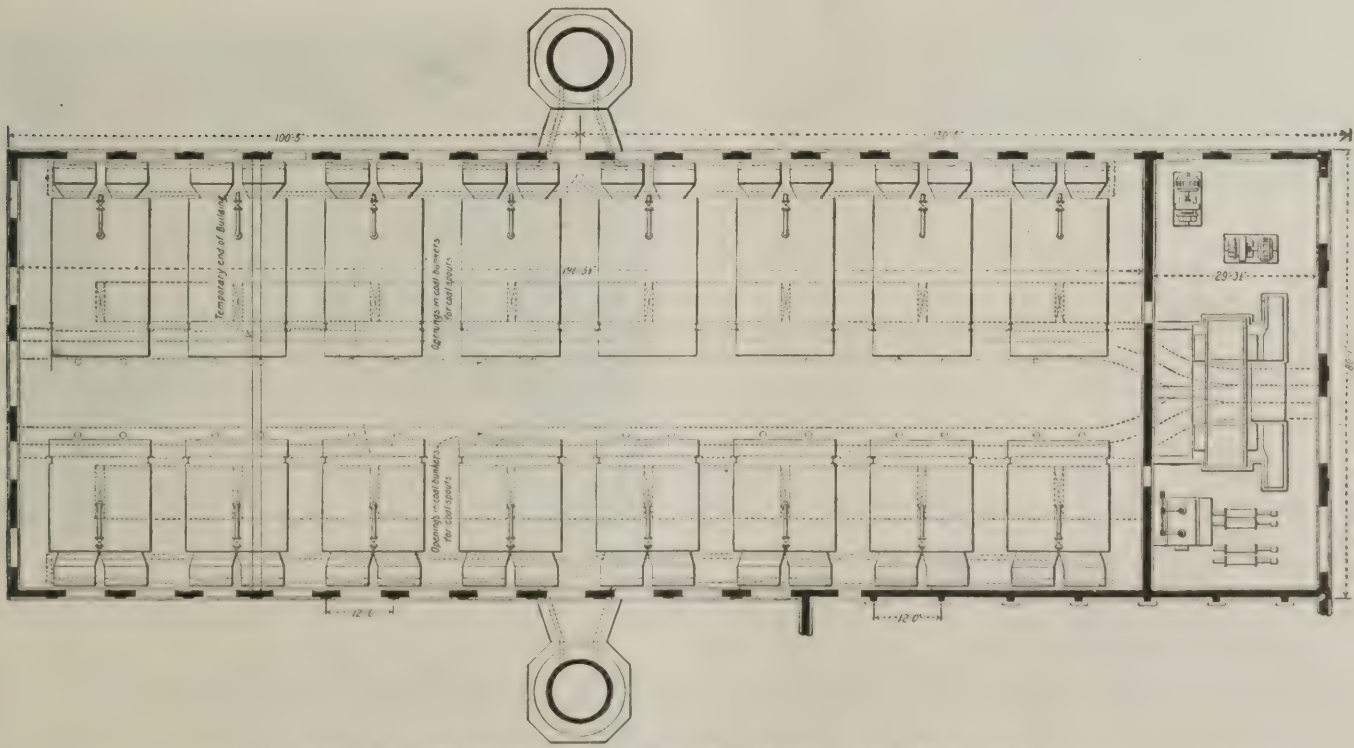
GROUND PLAN OF BOILER PLANT AND FAN ROOM
